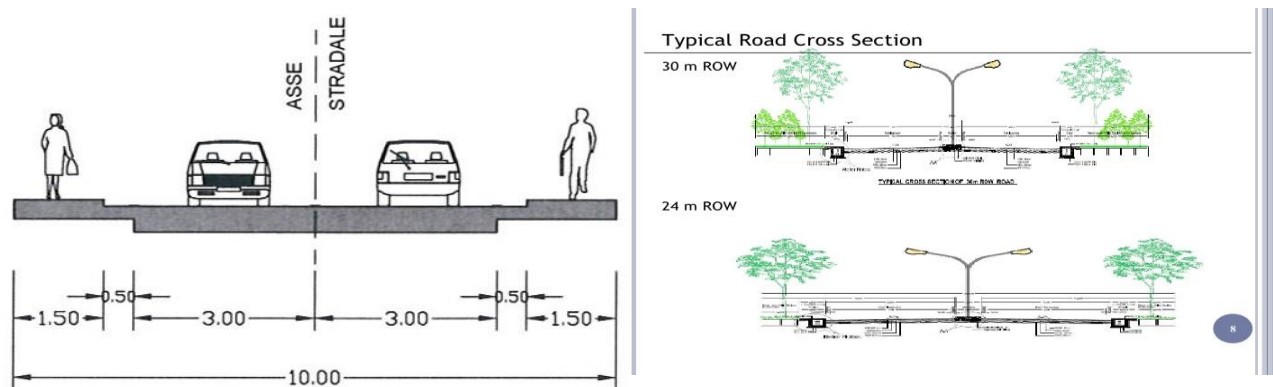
left urban road section view design neighborhood street and right lighting system on road.
